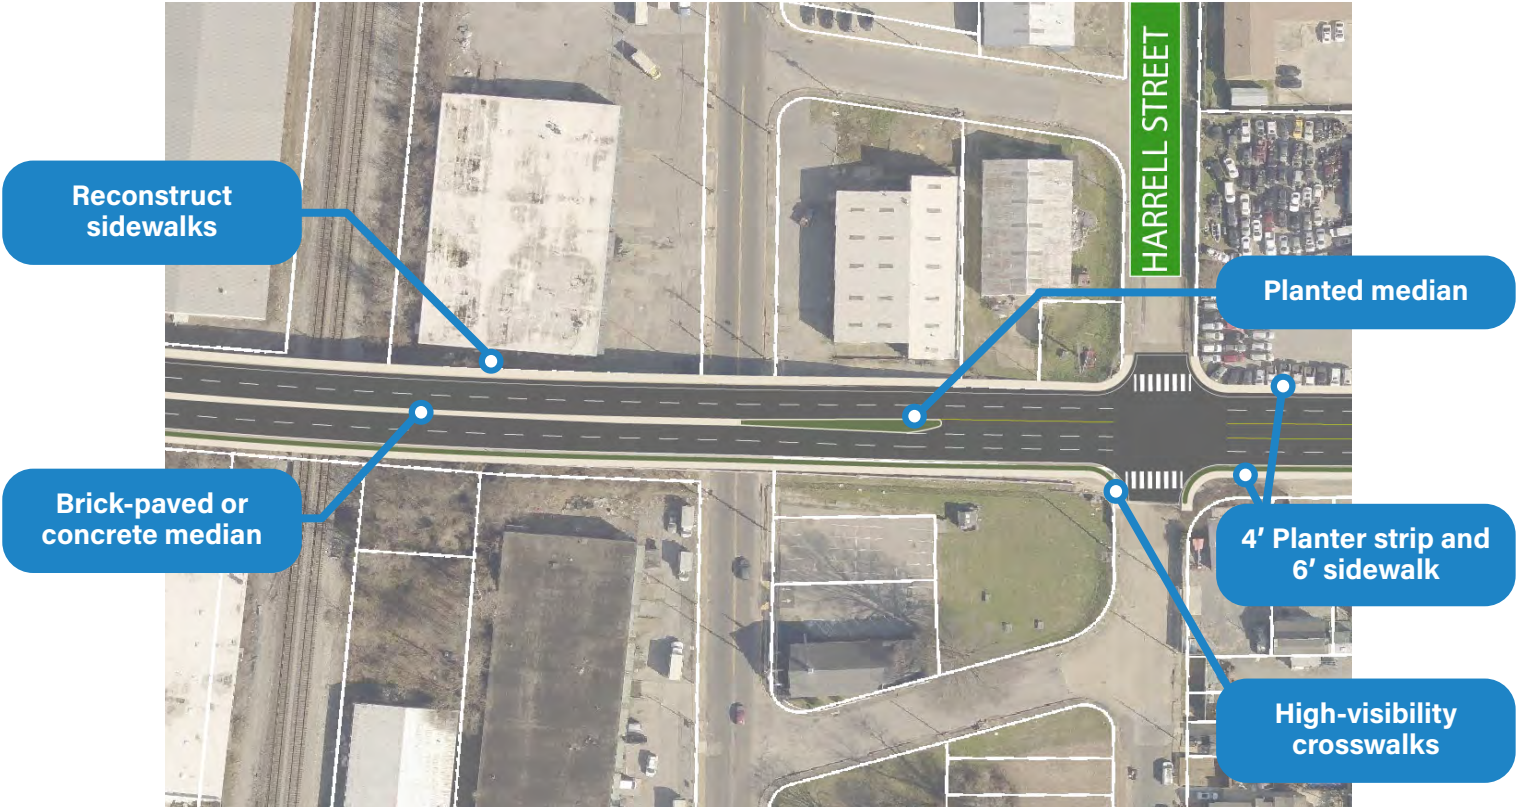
Conceptual design of the bridge crossing Scott Street.
